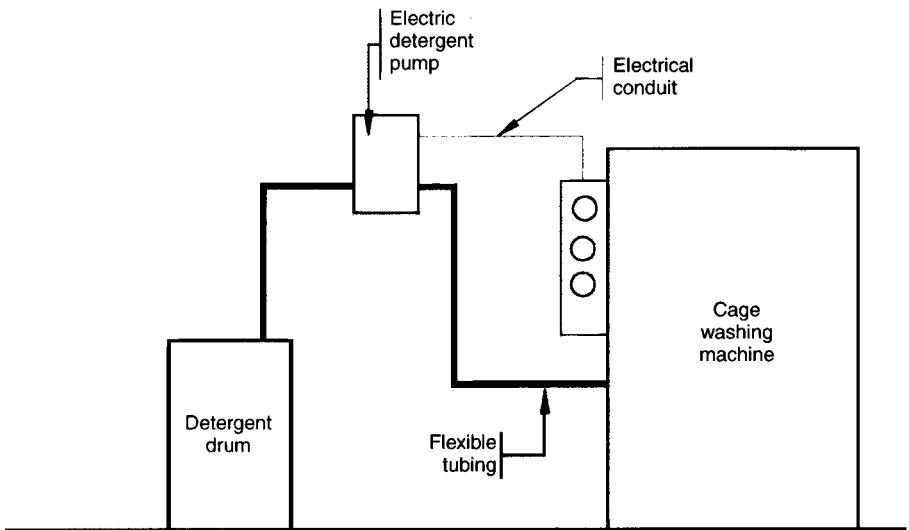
Typical cage washing detergent-dispensing system detail.
